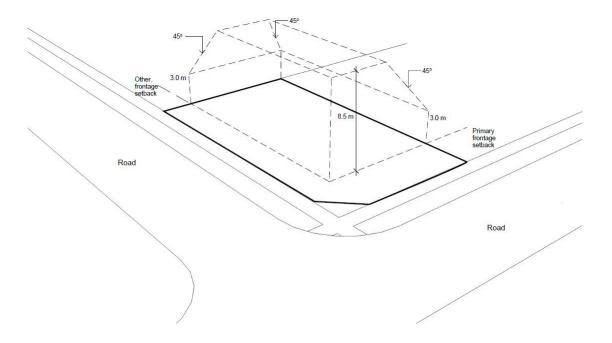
Building envelope for corner lots as required by clause 10.4.2 A3(a)
